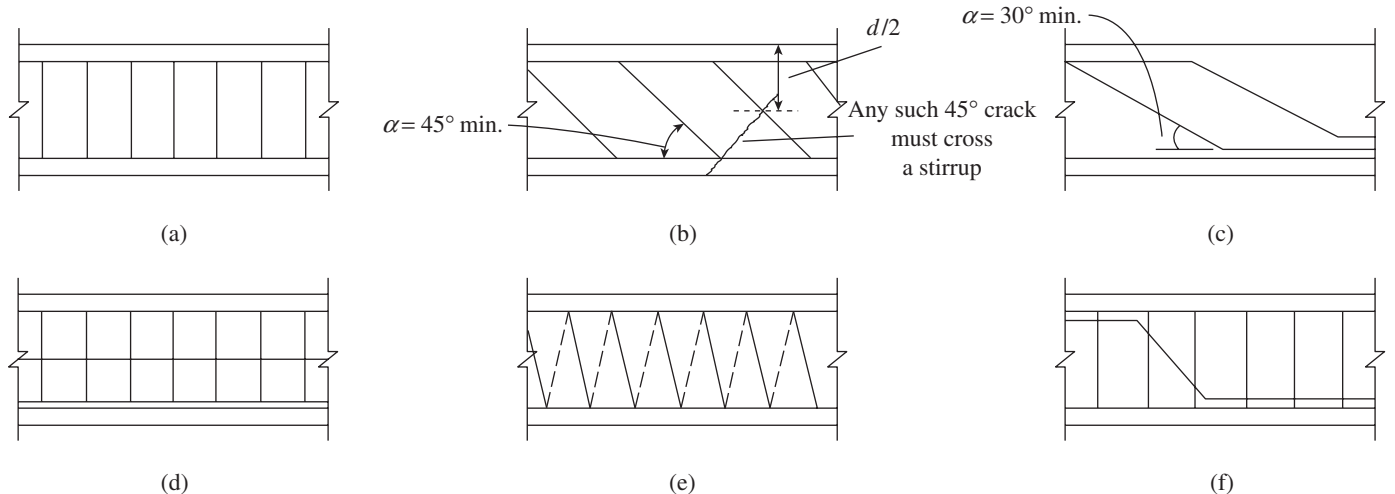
Types and arrangement of stirrups (a) Vertical stirrups (b) Inclined stirrups (c) Longitudinal bent bars (d) Welded wire fabric (e) Spirals (f) Combined bent bars and vertical stirrups
